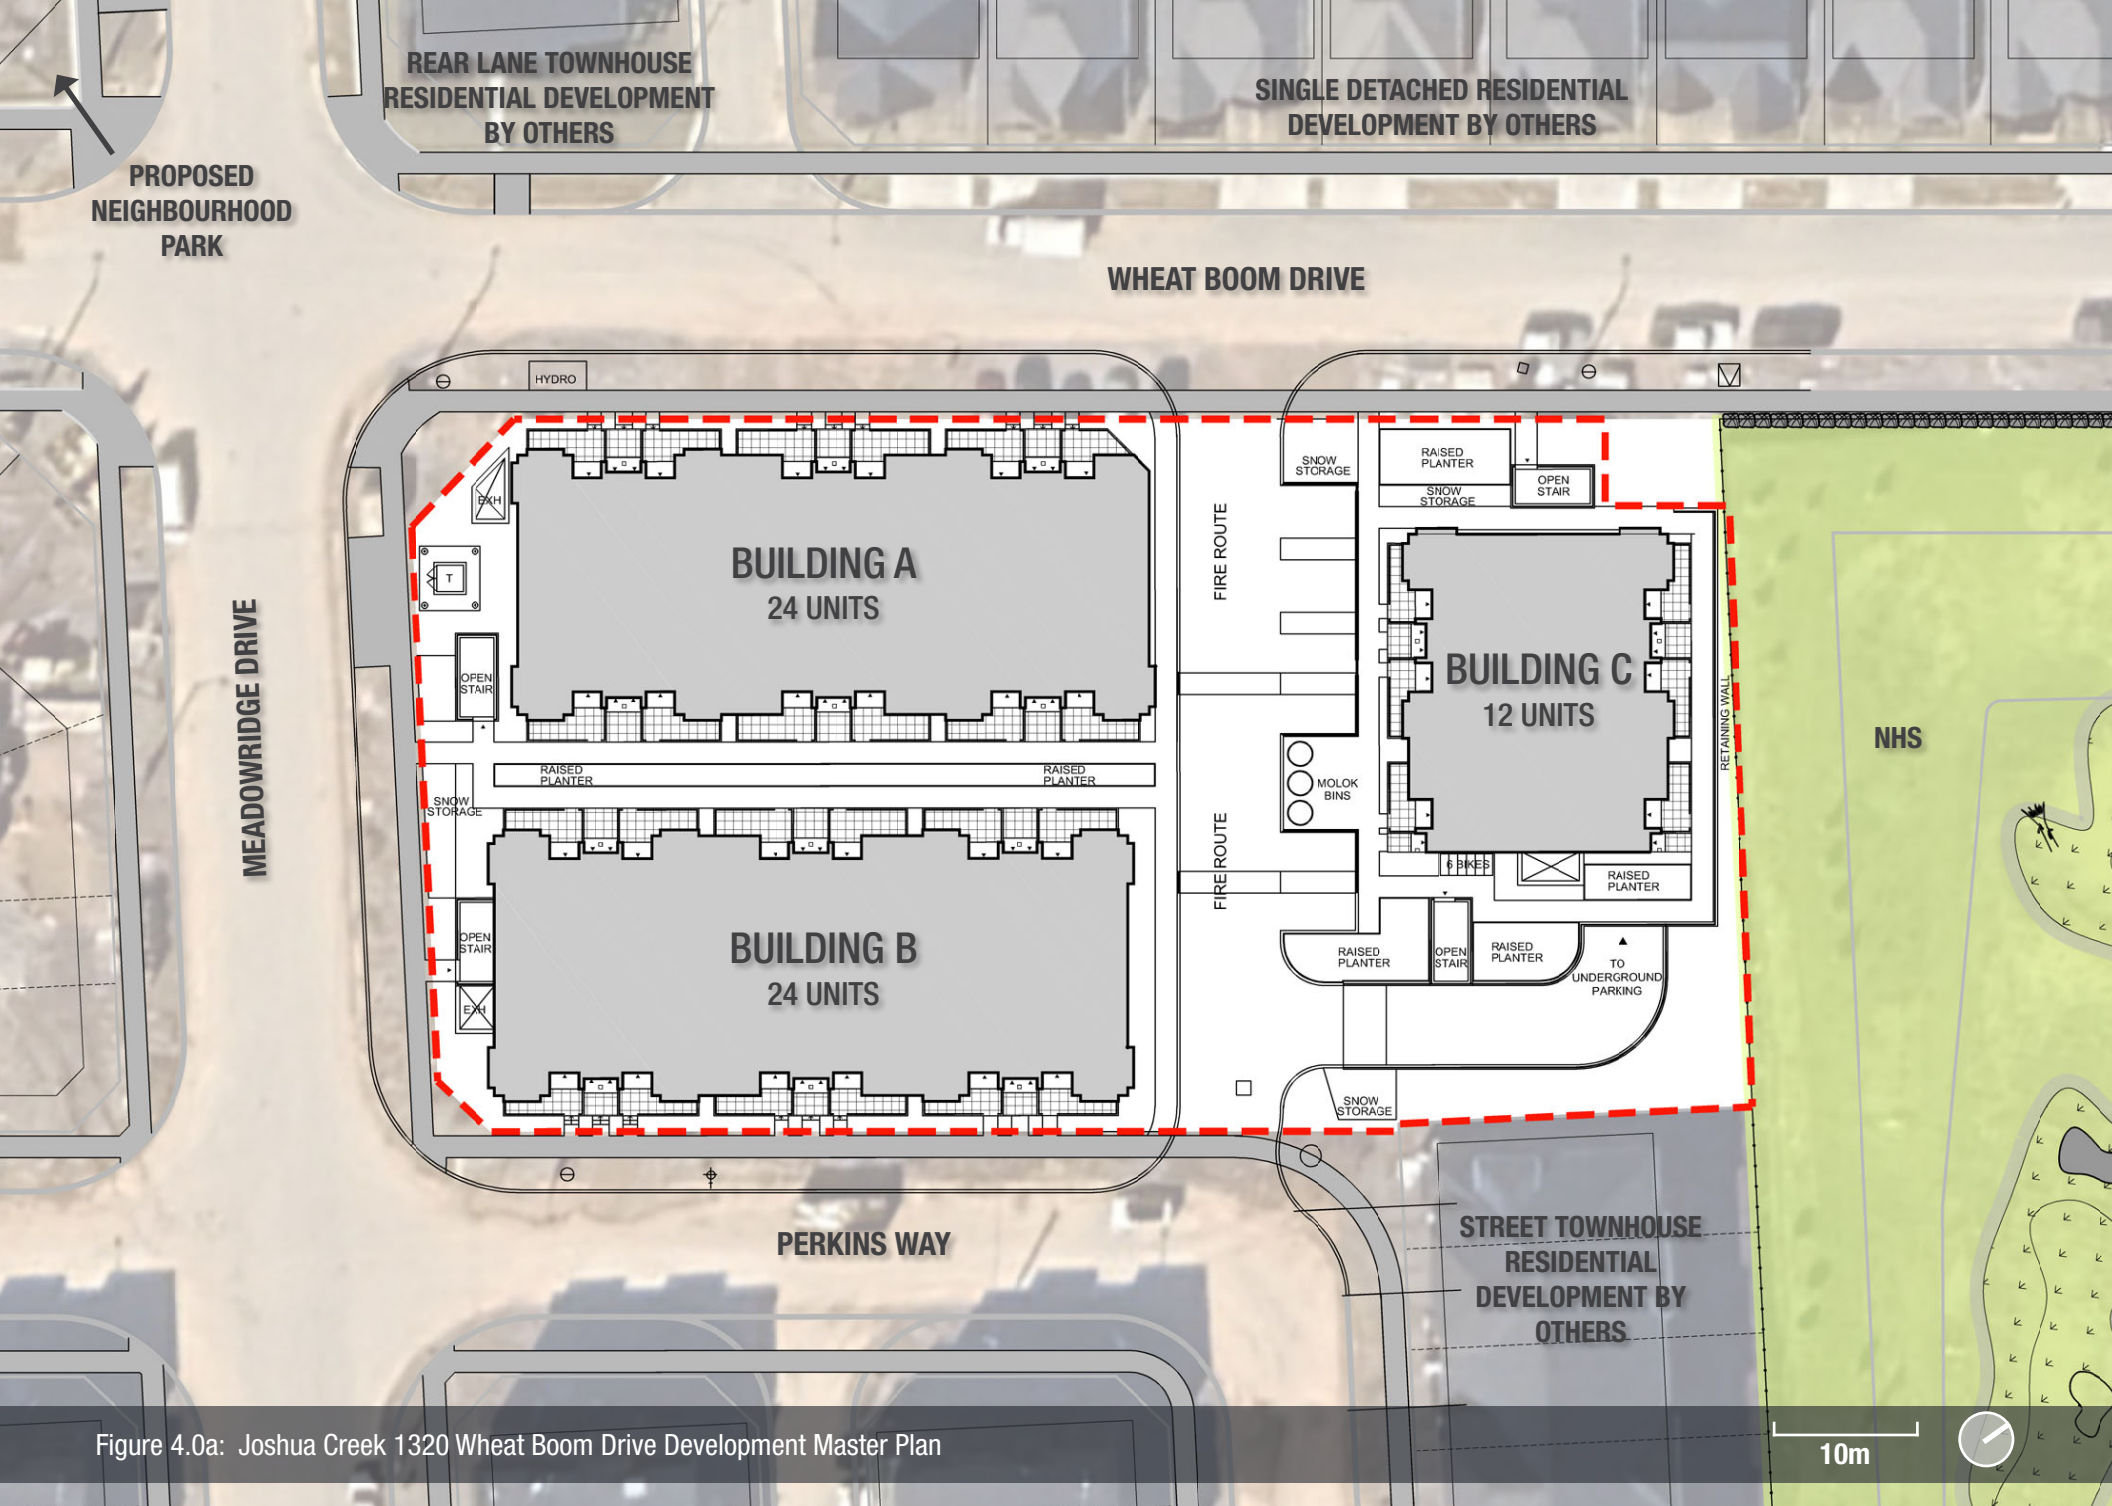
Joshua Creek 1320 Wheat Boom Drive Development Master Plan
